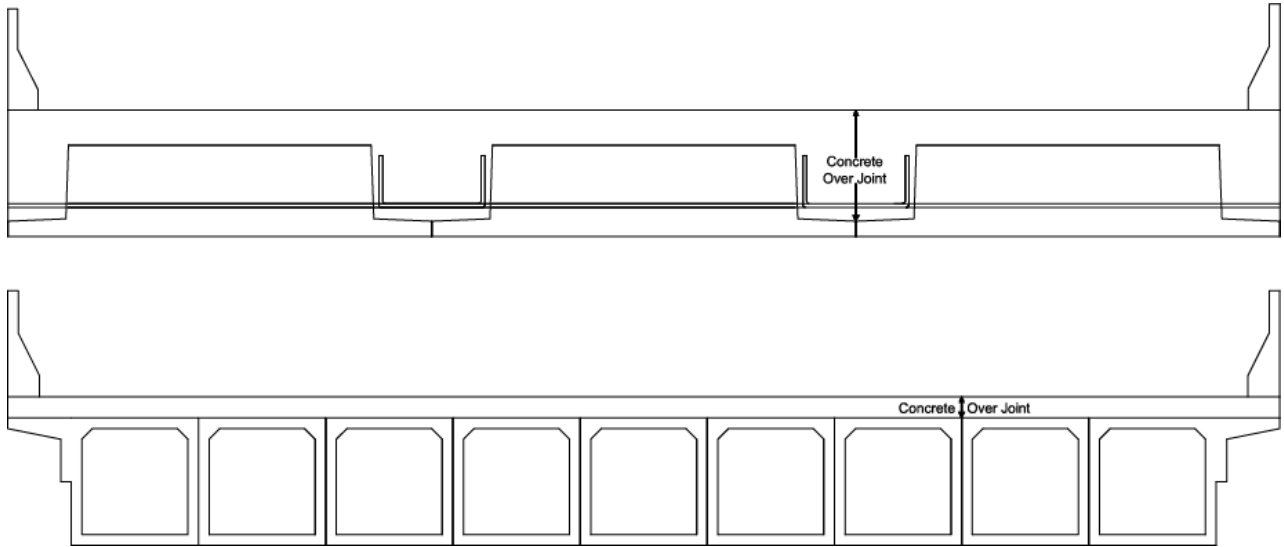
Depth of CIP Concrete over Longitudinal Joint of Inverted-T System (top) and Adjacent Box Girder System (bottom)
